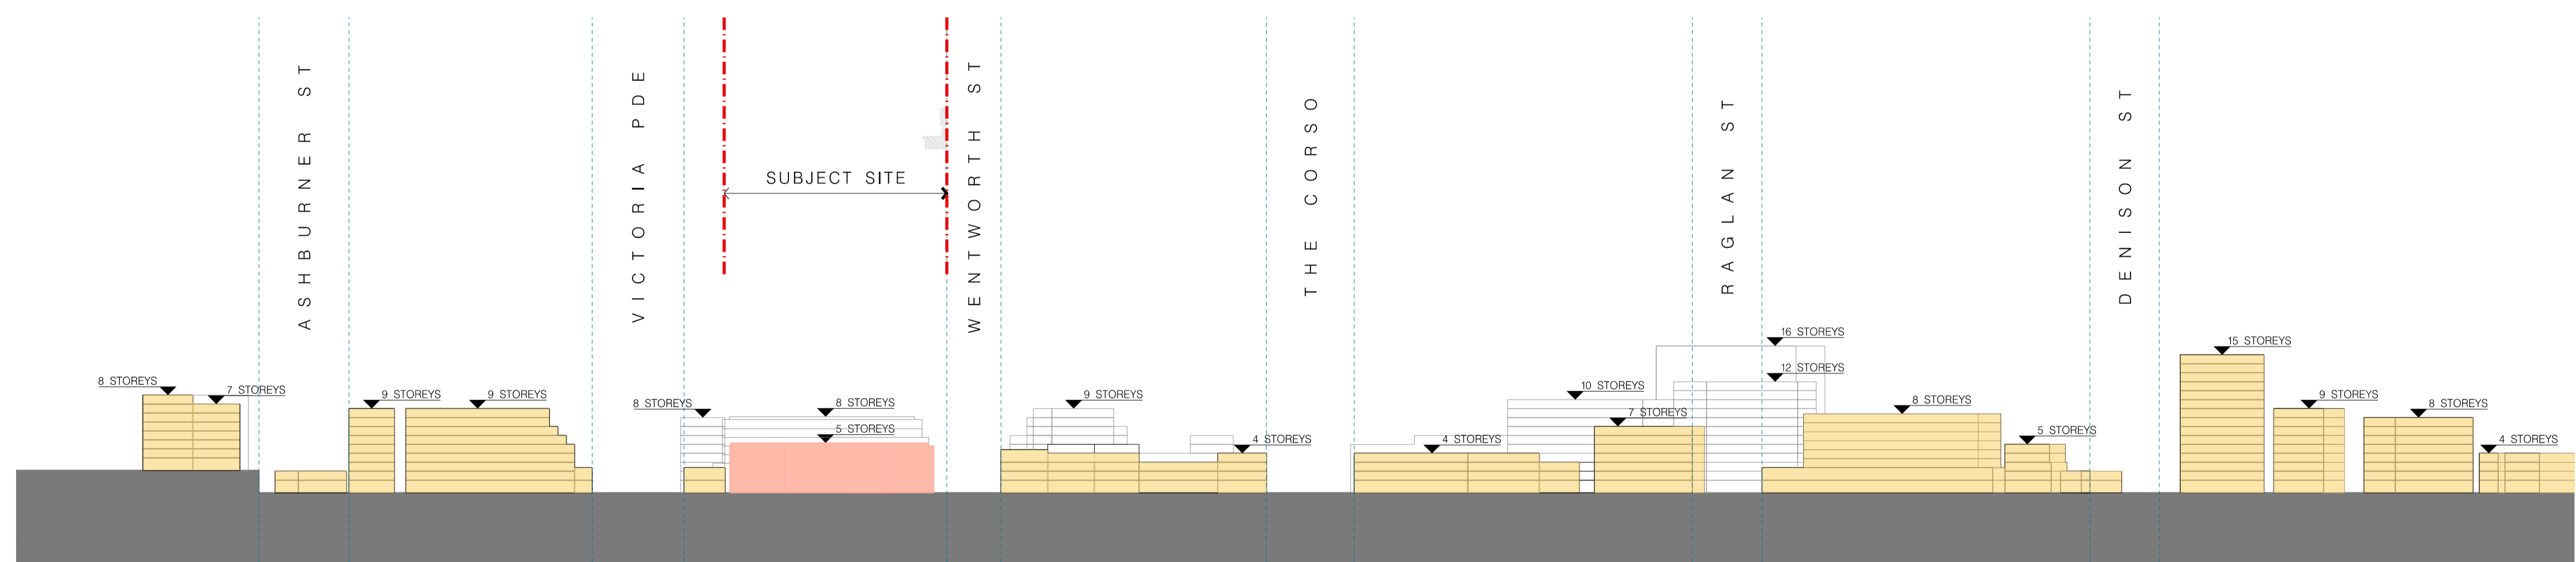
DETAILED DEVELOPMENT APPLICATION PLANS SHOWN IN GREY UNDERNEATH THE ENVELOPE PLANS FOR CLARITY.
